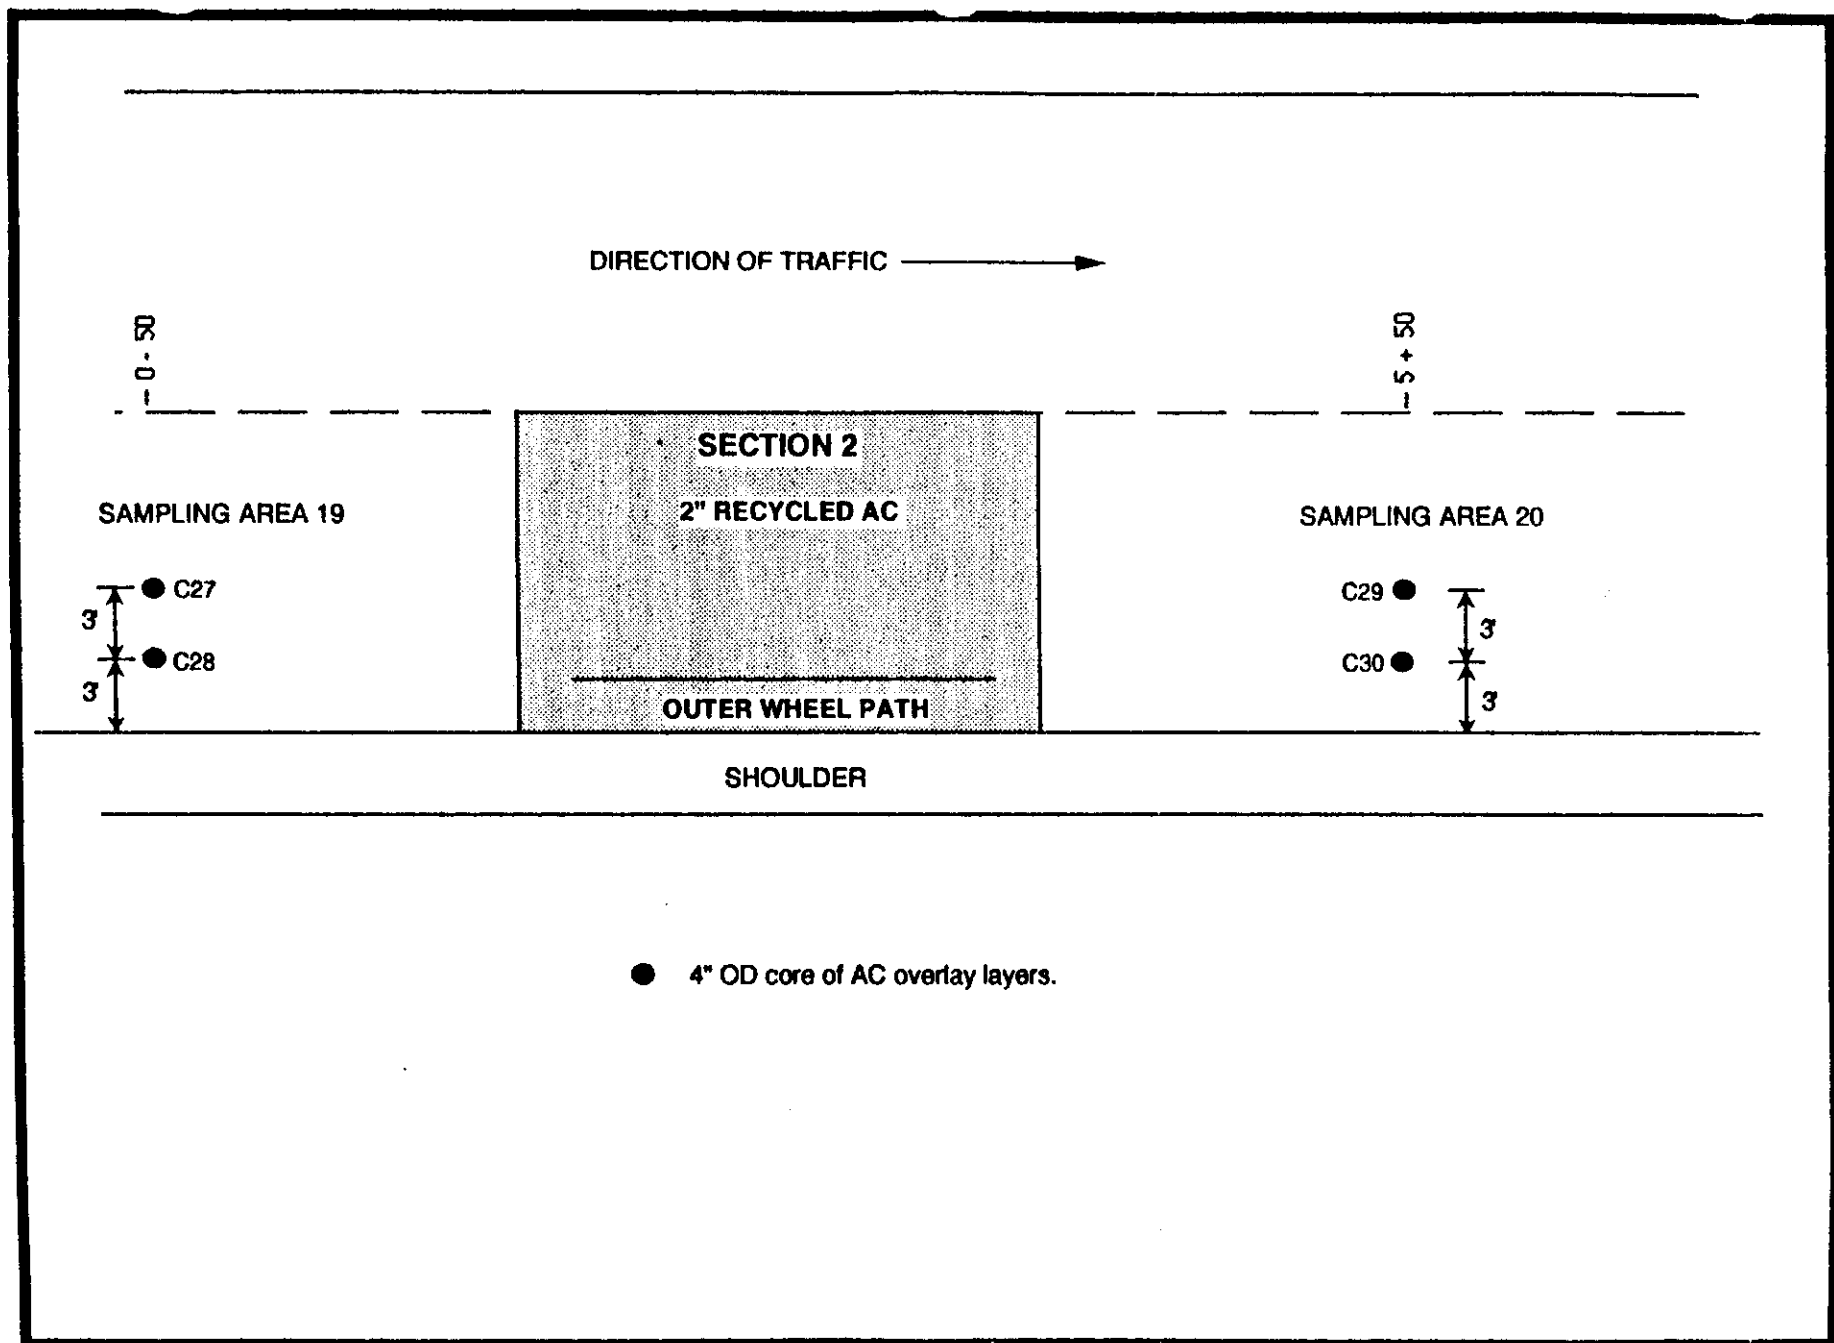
Example of "Post-Construction" Sampling Plan for Section 2.
